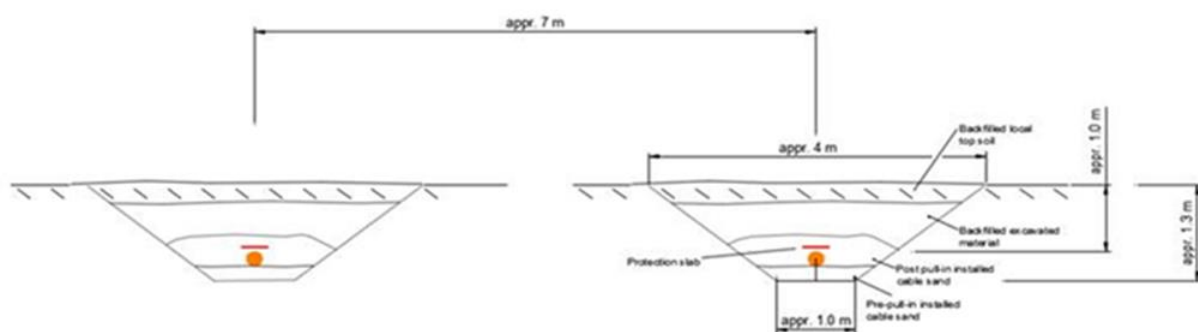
Onshore Cable Trench Cross-section a Two-Trench Design
